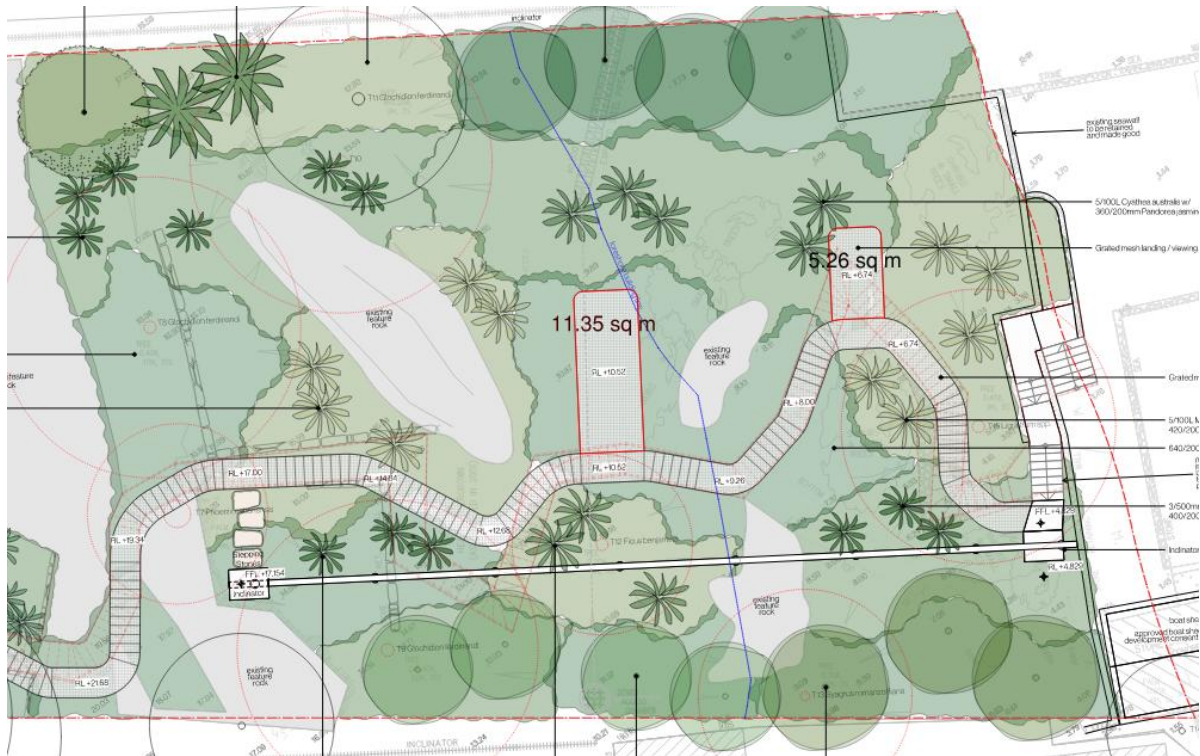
proposed landscape plan showing access path, inclinator and 2 viewing platforms
